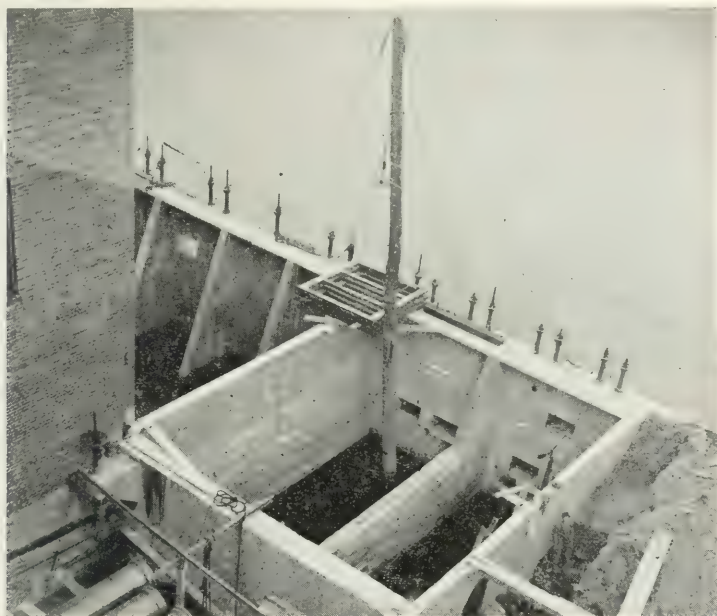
INTAKE SYSTEM FOR POWER HOUSE
